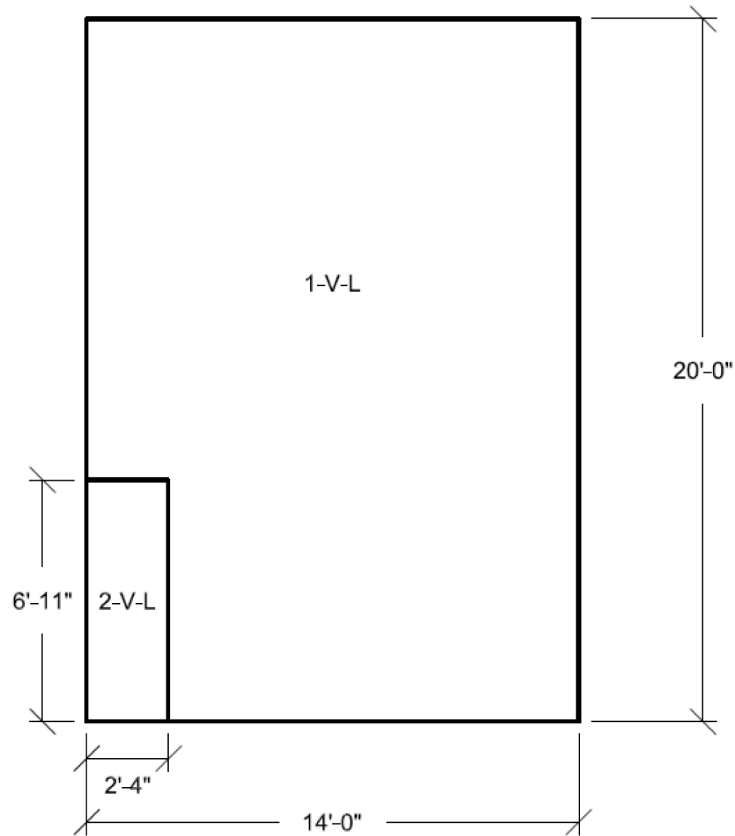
H.6-174 DGFOV Wall 9 Looking From Outside Vertical Reinforcement Zones Near Side Face
